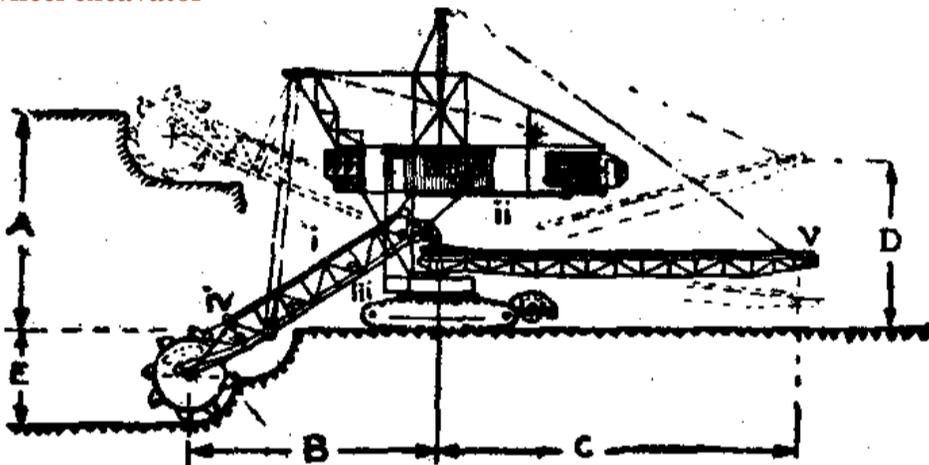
\$. General arrangement of a bucket wheel excavator
